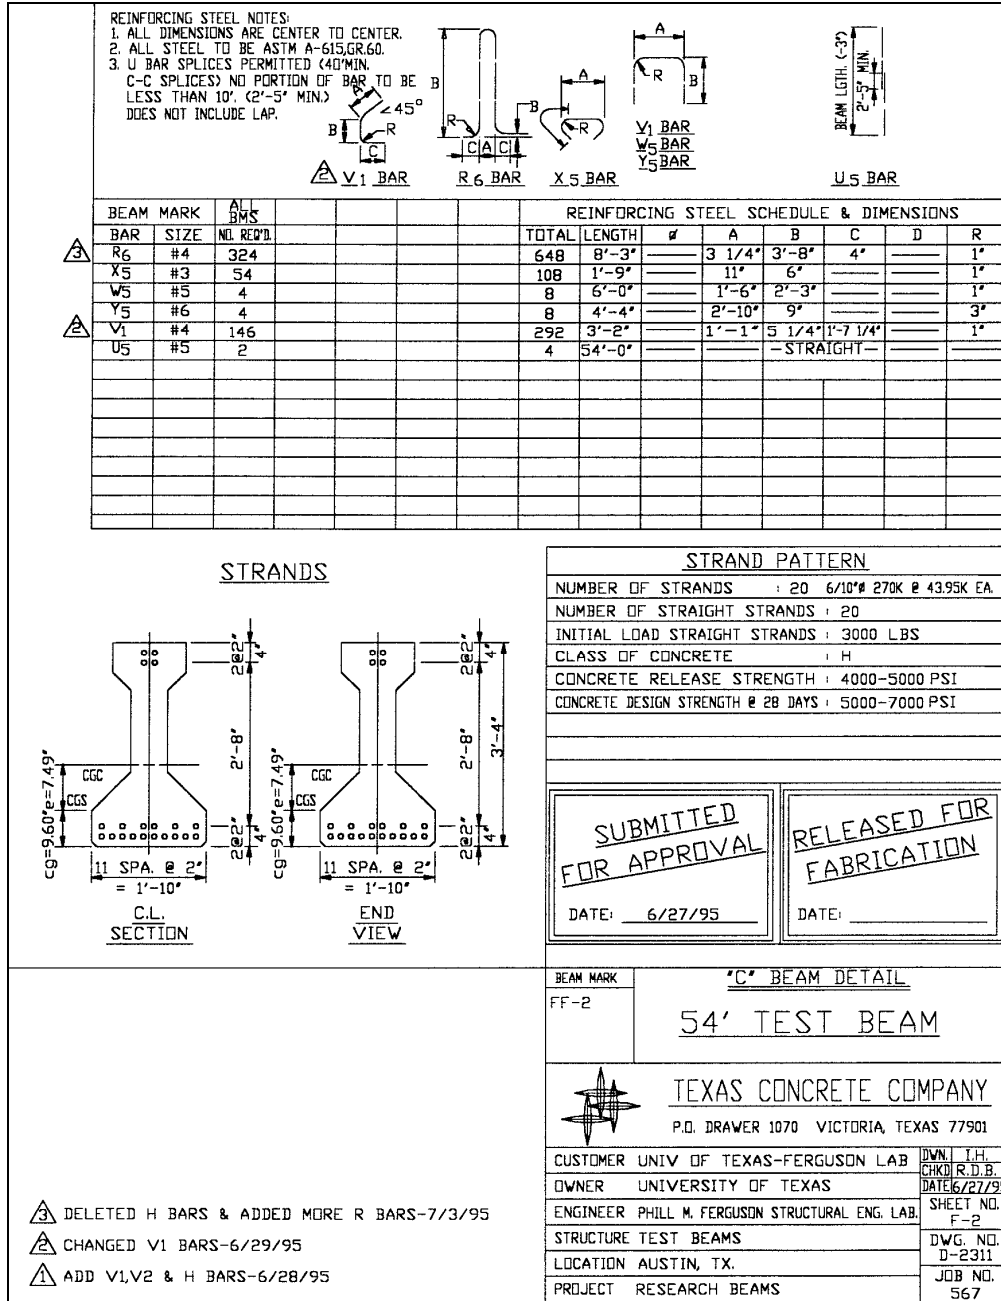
Normal-strength concrete test beam shop drawing (Part 1 of 3)
